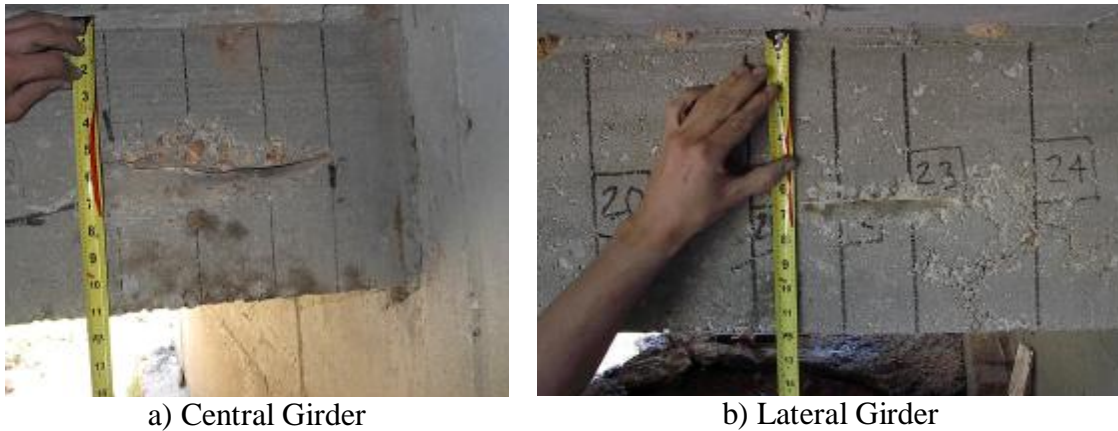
Concrete Chipped Off to Find Shear Reinforcement
